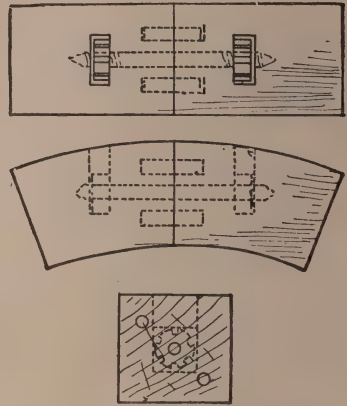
Curved Head Jointed with Handrail Bolts and Dowels
